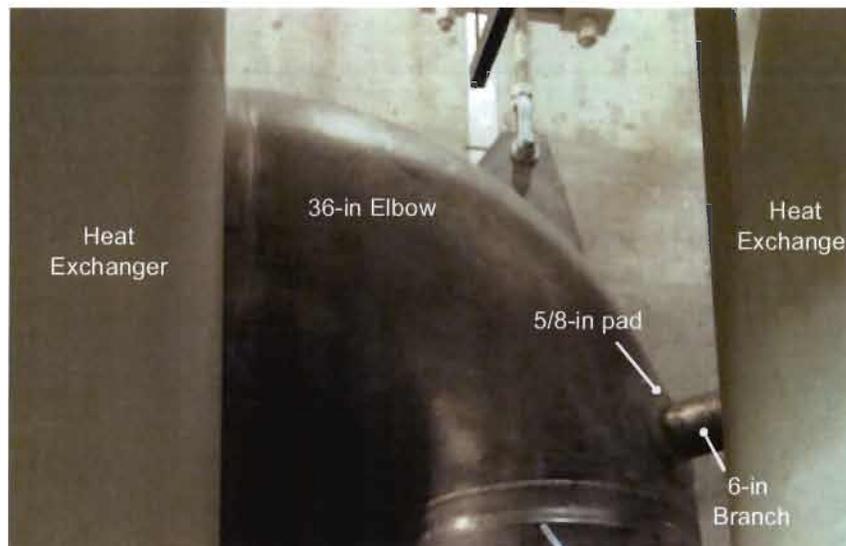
Model 14's unlisted elbow/branch component is shown, viewed looking South.
